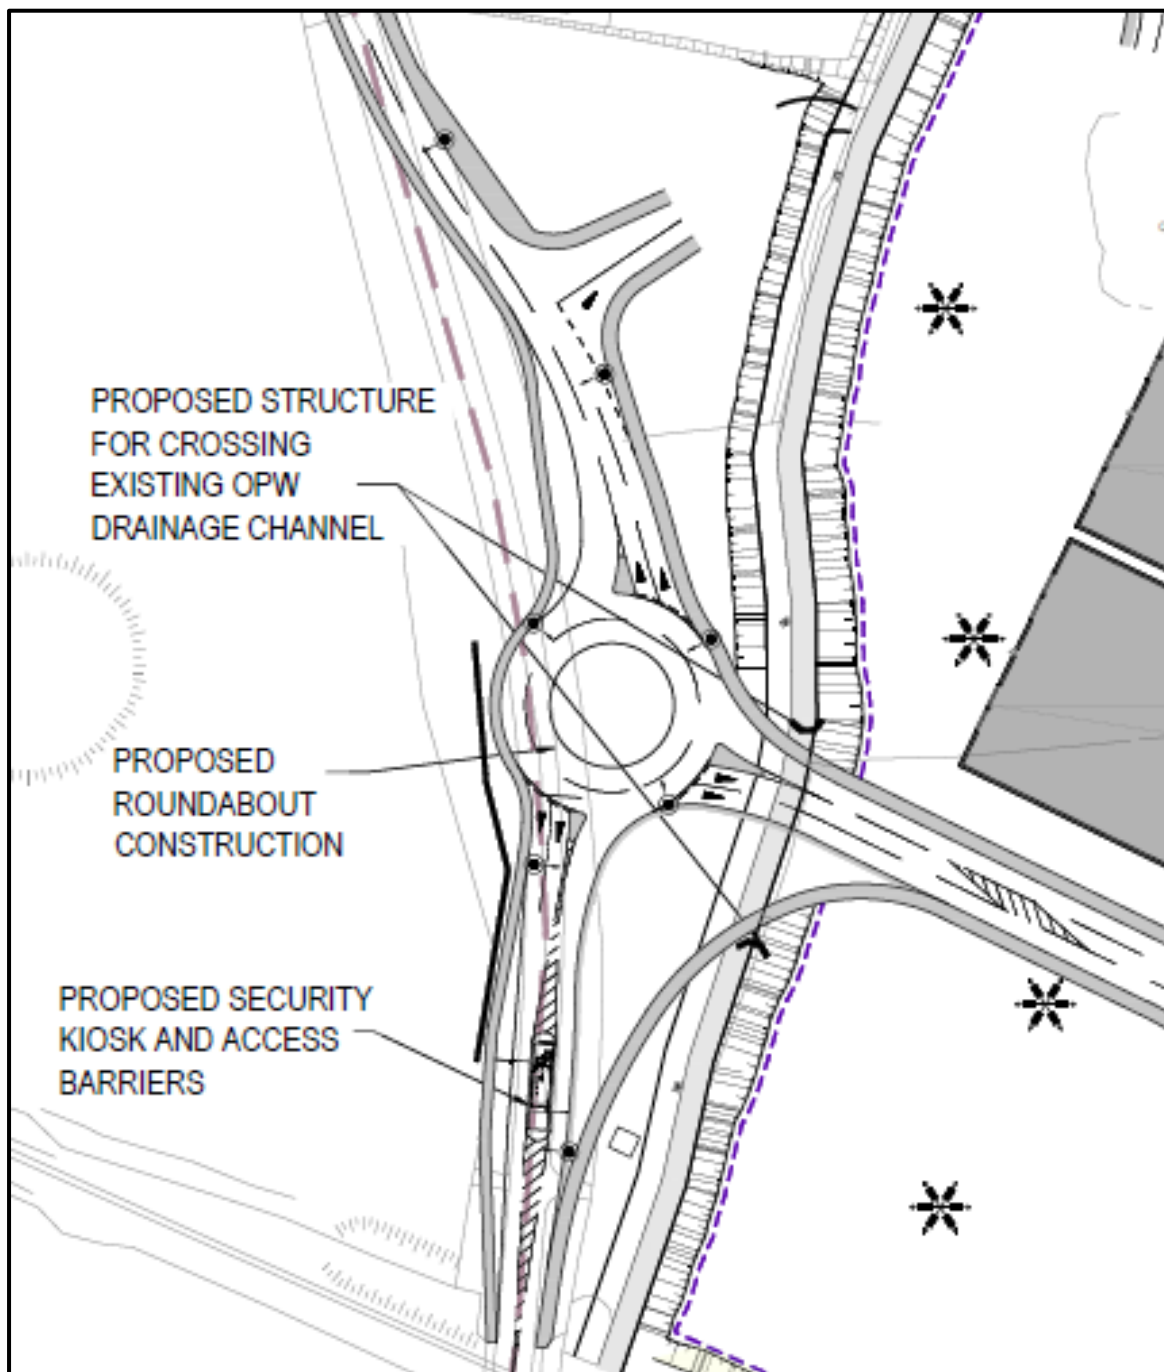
East Site Access: Security Kiosk / Access Barrier
